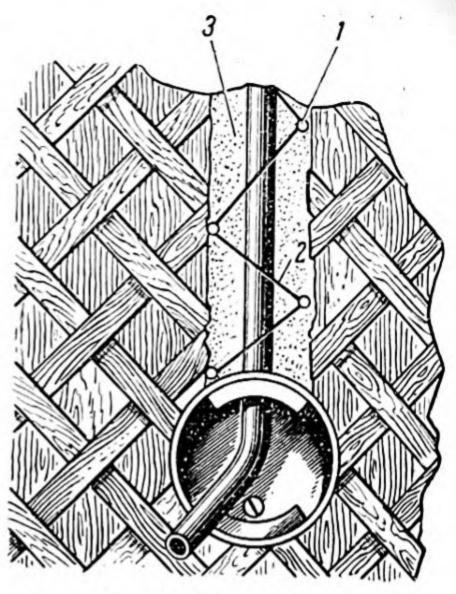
Semihard rubber tubing fixed to wooden surface to be plaster finished:
